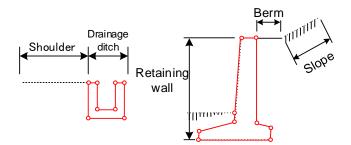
How to create "Perimeter" of a structure (left: drainage ditch, right: retaining wall)
